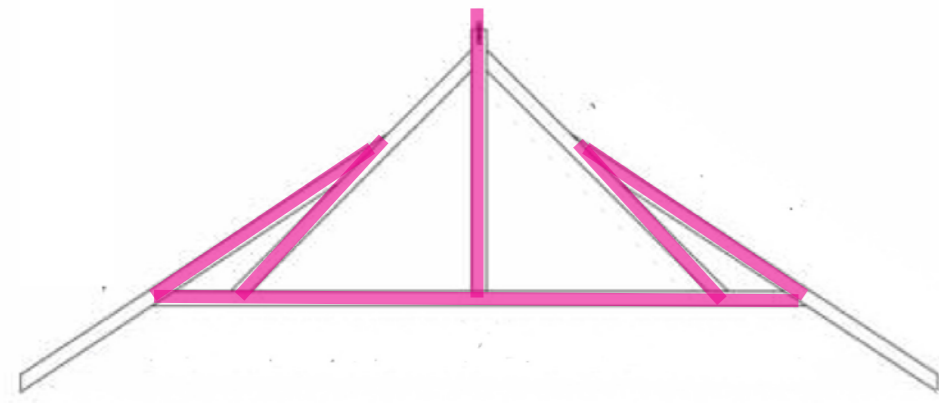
Dutch Gable roof truss for Sago Palm leaves roofing or for corrugated galvanized steel sheeting.
